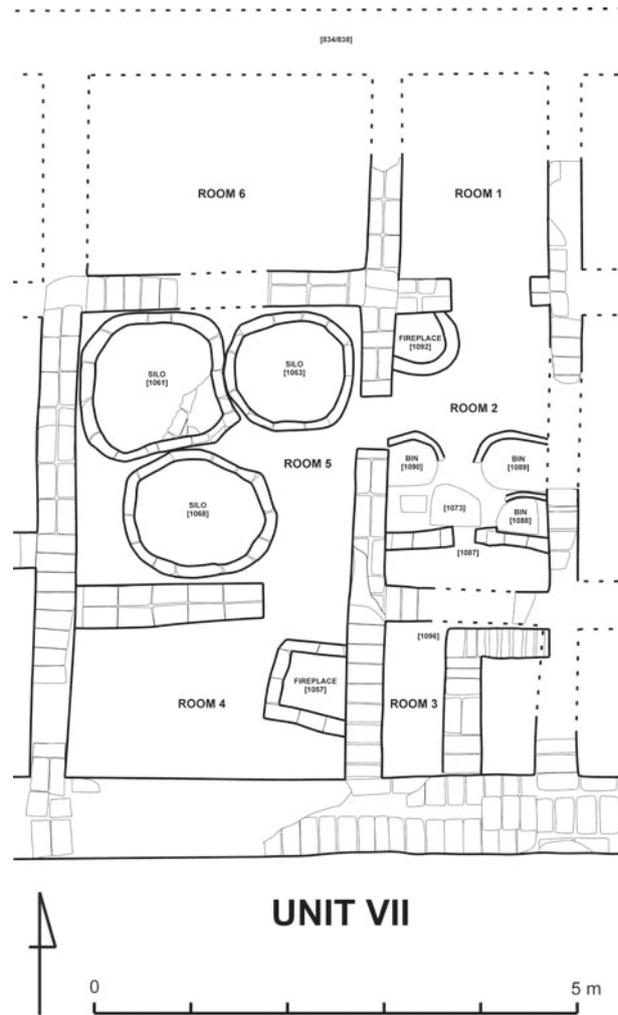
Plan of unit VII in the building [834/838], first occupation phase (Drawing Ł. Jarmużek).
